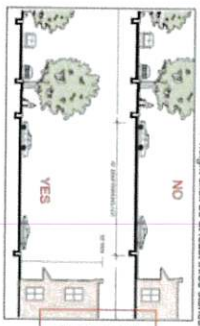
This image depicts how buildings in conventional parking in the area between the building's facade and the street it fronts, provided the building is three stories in height or greater.
